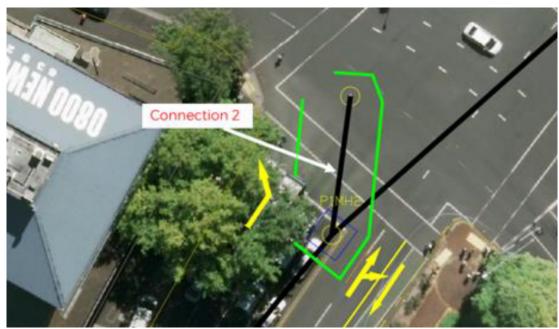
Plan view of short-term TM for an EOP connection using opencut method
